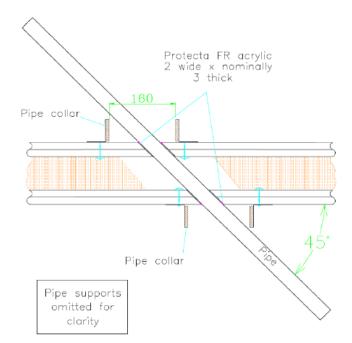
General arrangement of plastic pipes installed at an angle and protected with Protecta FR Collar
